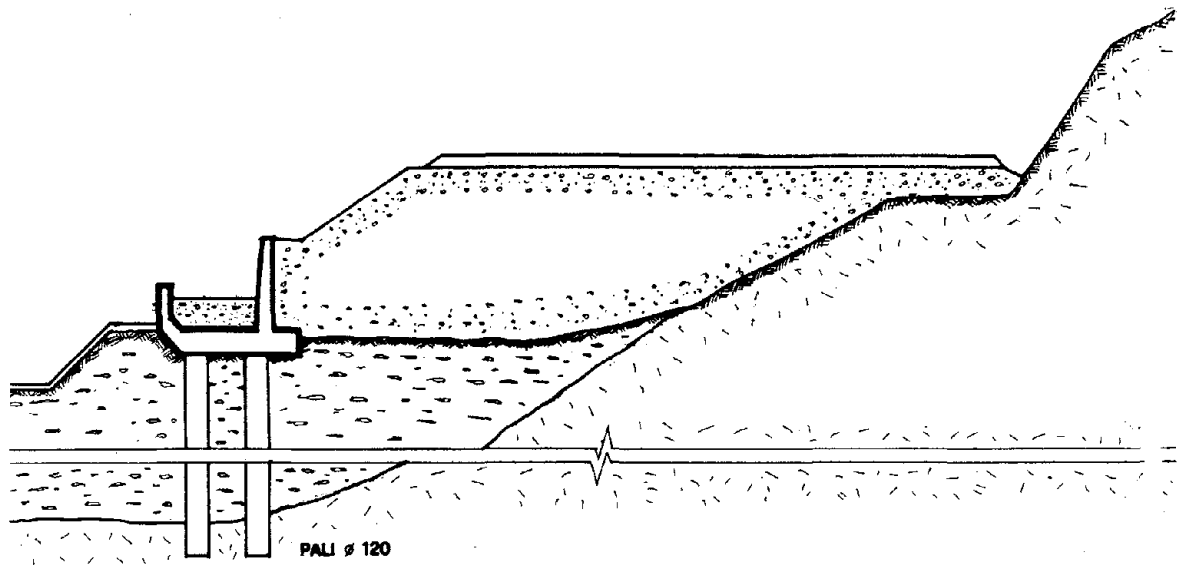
UDINE-CARNIA-TARVISIO HIGHWAY, SECTION THROUGH EMBANKMENT RETAINING STRUCTURE ADJACENT TO CANAL -FROM (10)
